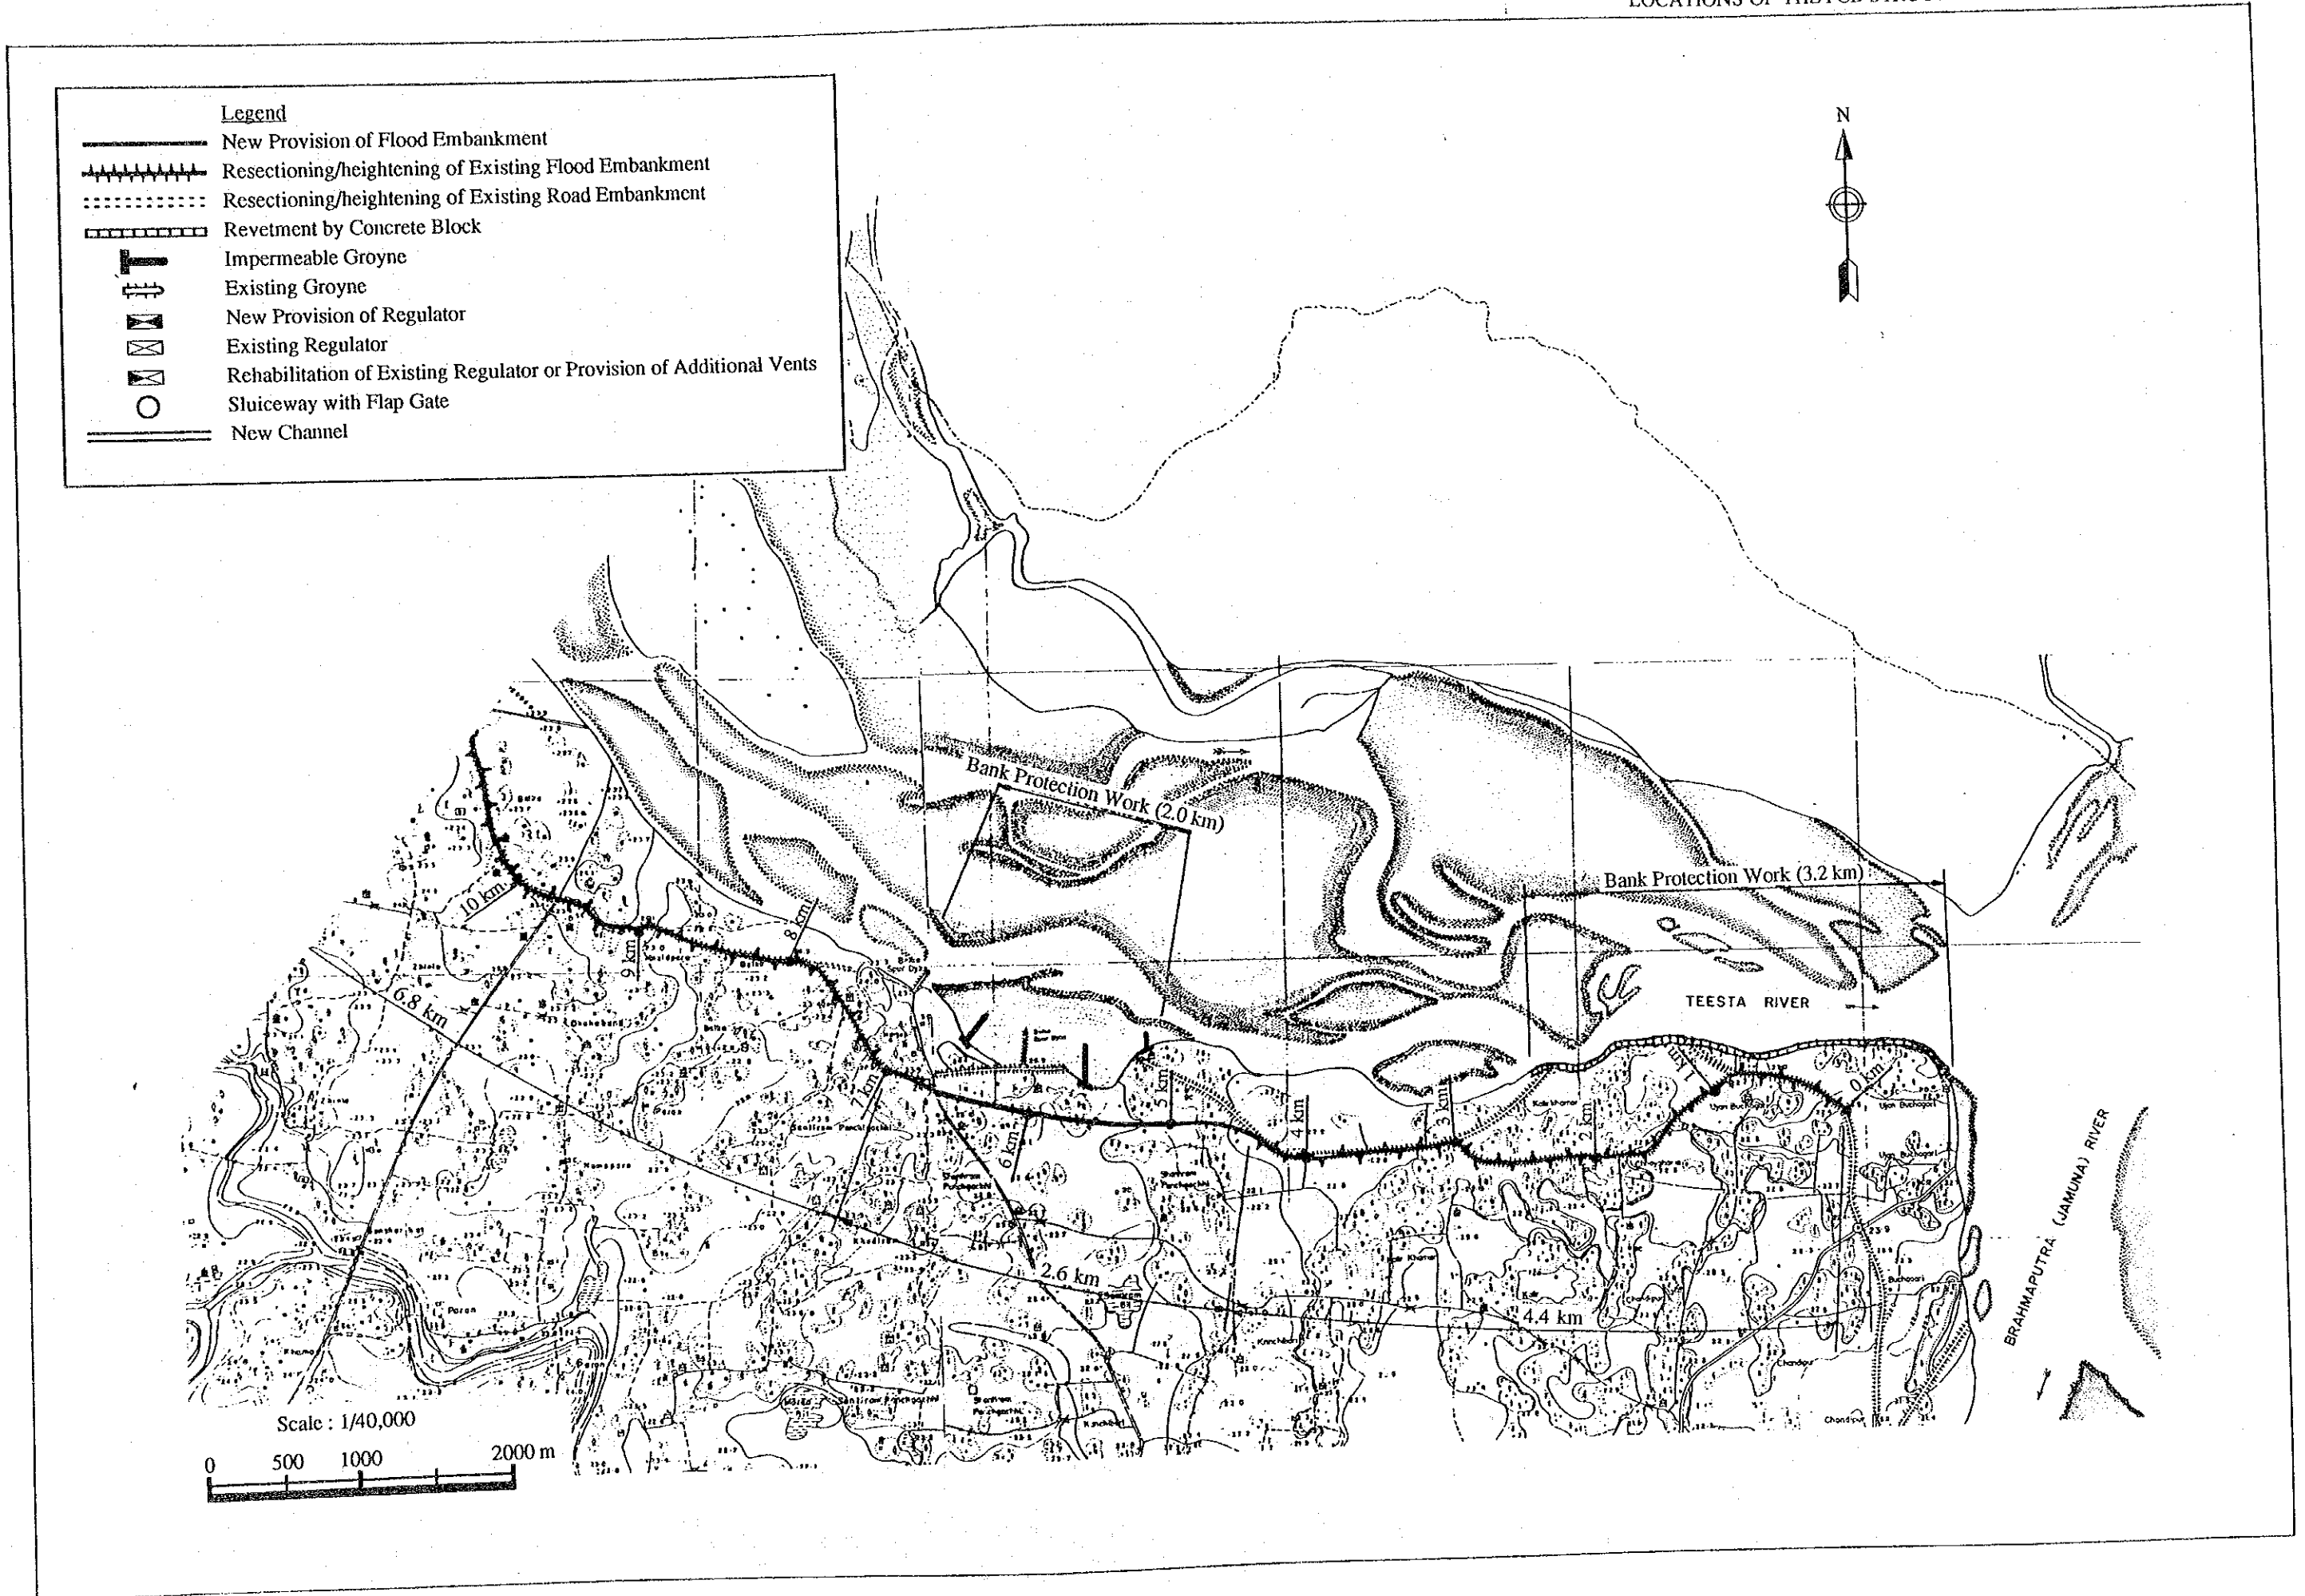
PROPOSED ALIGNMENT OF FLOOD EMBANKMENT AND LOCATIONS OF THE FCD STRUCTURES ALONG THE TEESTA (2/3)
